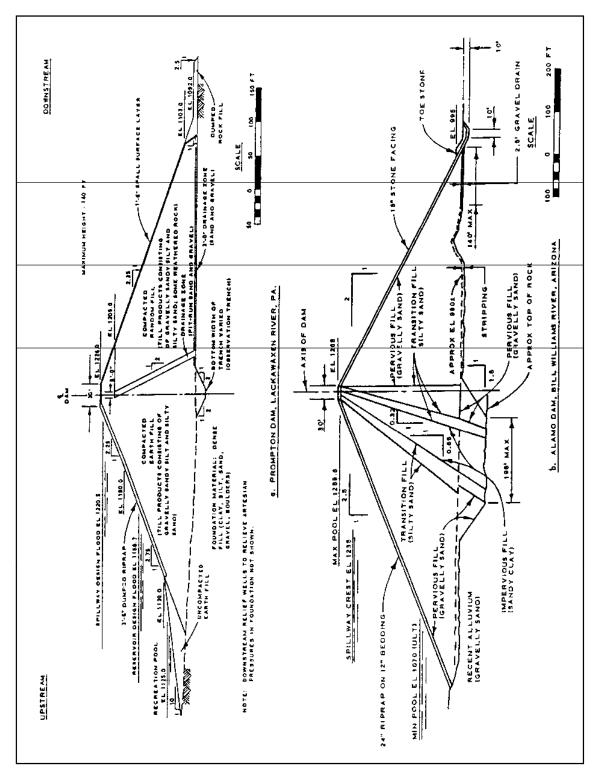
Typical embankment sections, earth dams (Prompton and Alamo Dams)
